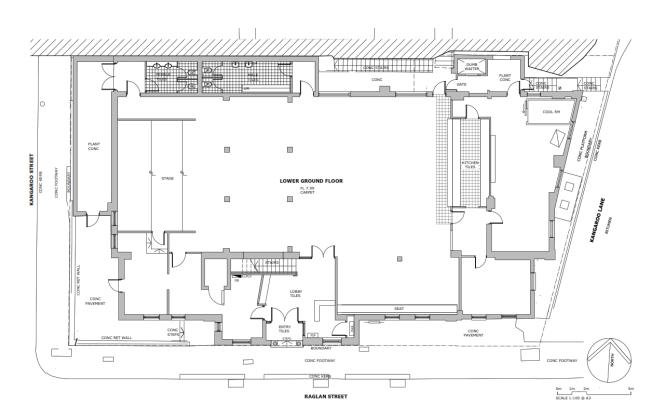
52 Raglan Street existing lower ground floor (Building Assets Planning Design and Delivery)
